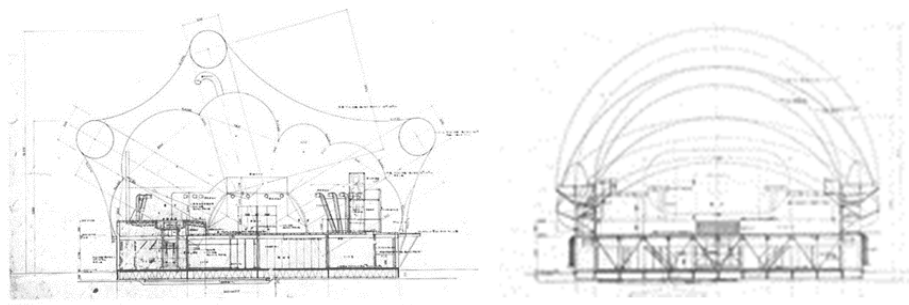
Cross & long section showing primary tubes in elevation. (Herzog 1976: 89)
